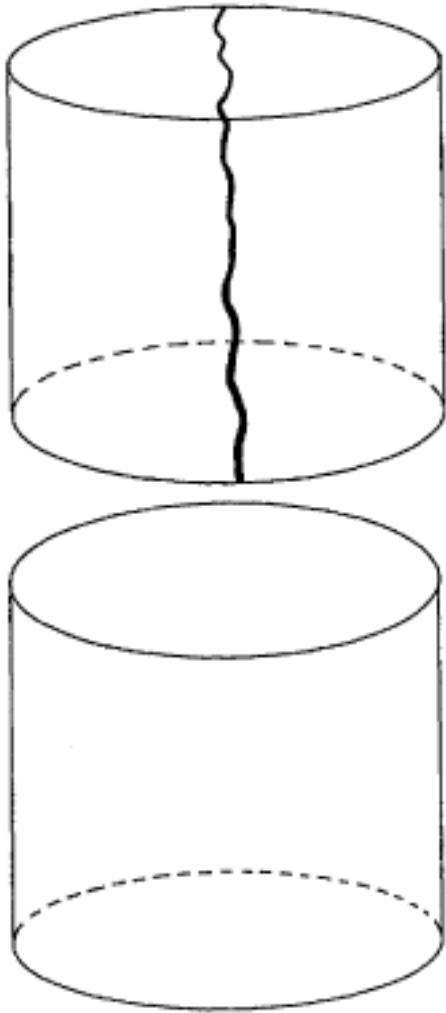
Line Drawings from Photographs of Core 1 from Cracked Section 500RF
